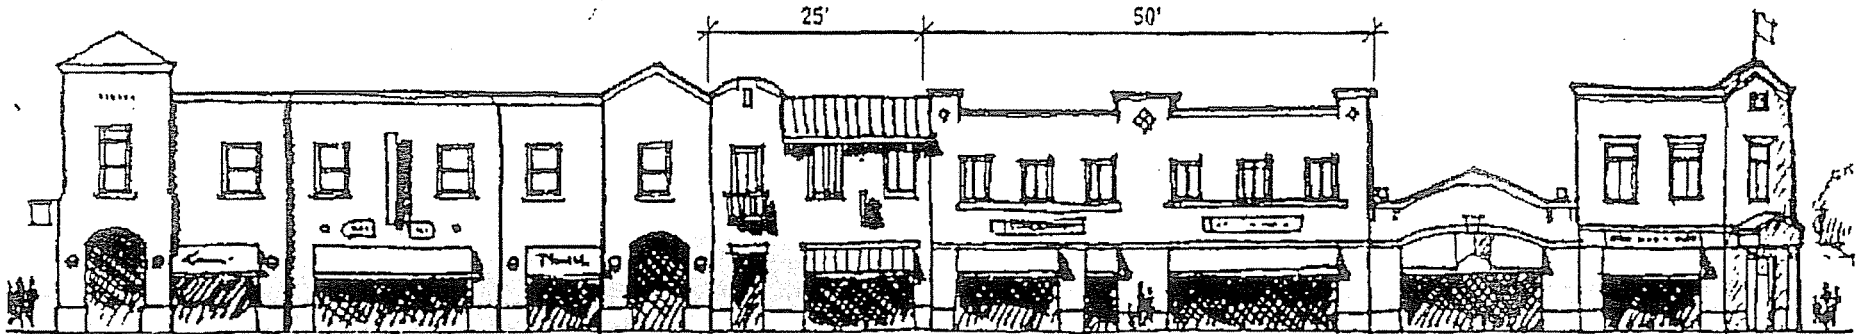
Example of Building Rooflines and Alignment of Horizontal Elements
